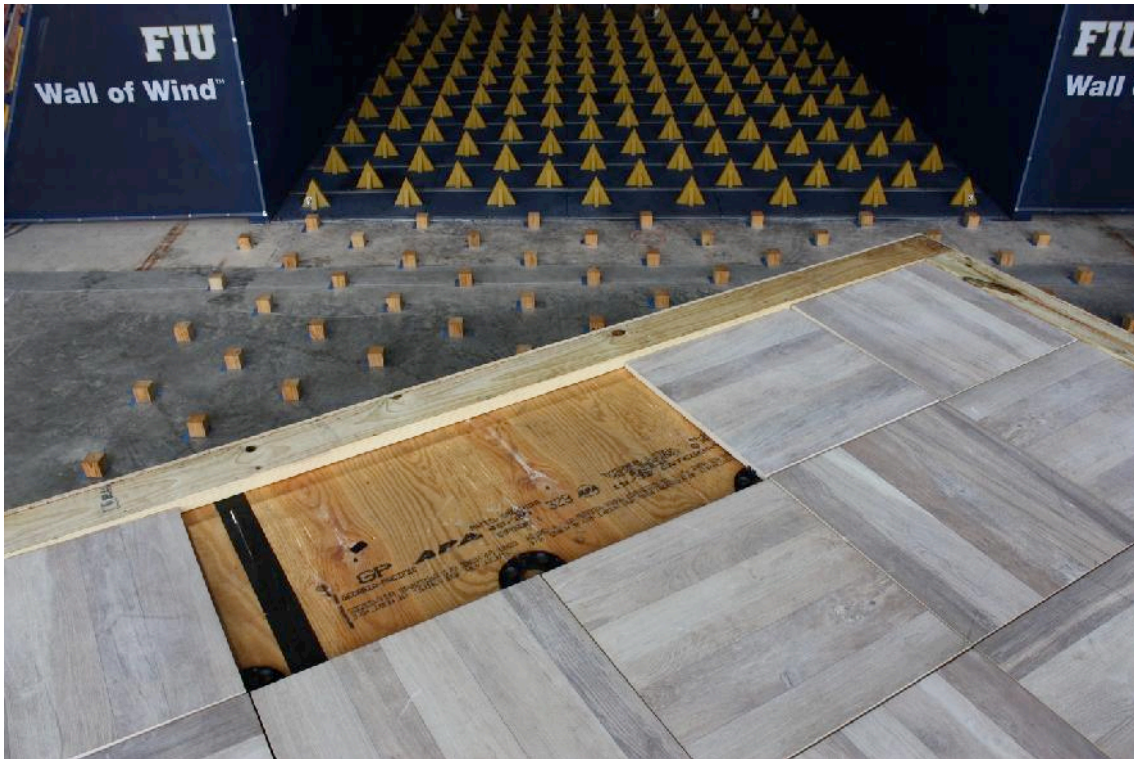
Location of porcelain pavers blown off by the wind. These were thrown off the roof deck by the wind and shattered upon impact. the configuration had a fixed height pedestal and 0 in. parapet wall
